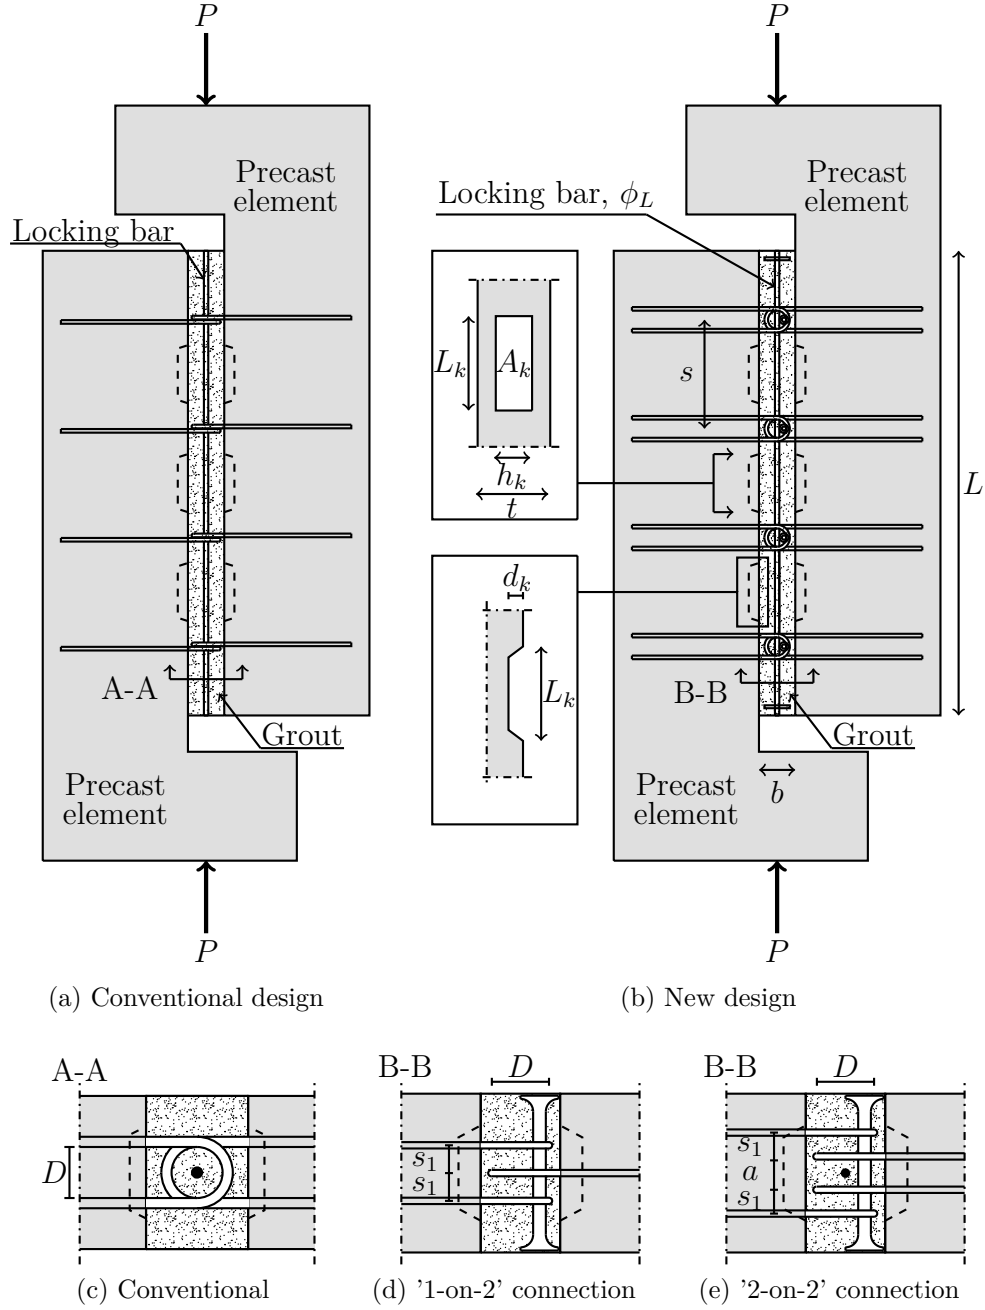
Layout of test specimens used in the experimental campaign and indication of the load application points
